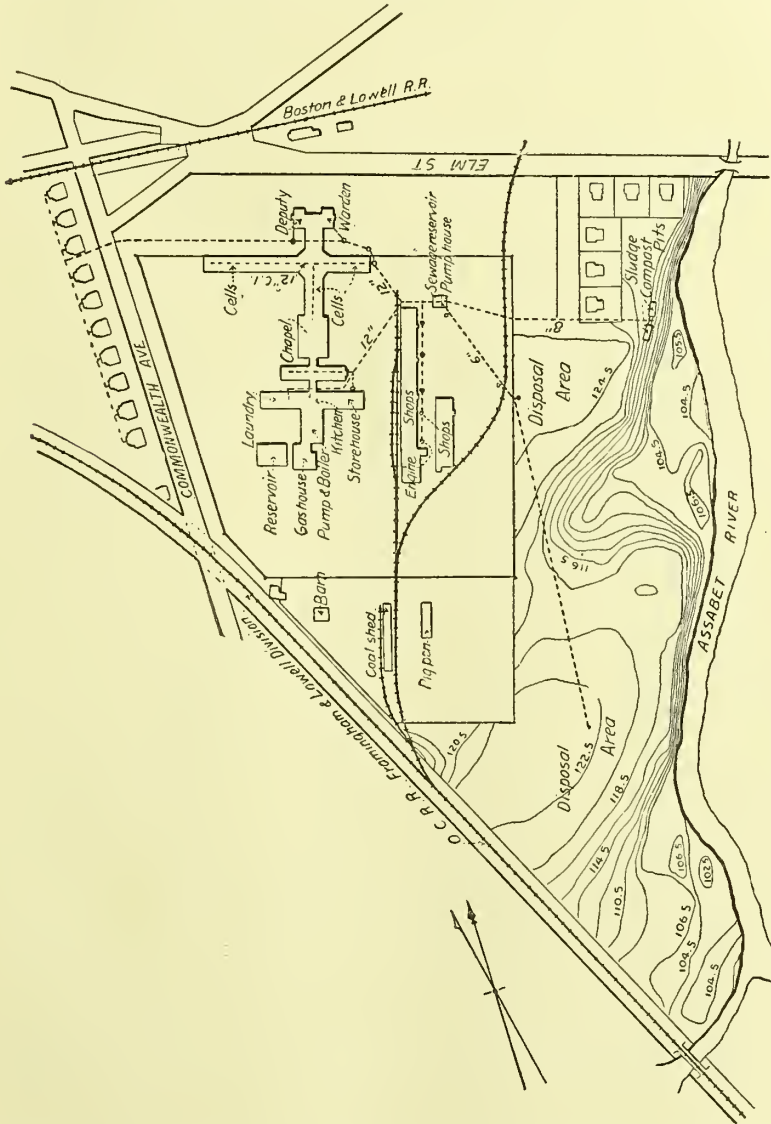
PLAN OF DISPOSAL WORKS, MASSACHUSETTS REFORMATORY, CONCORD.
